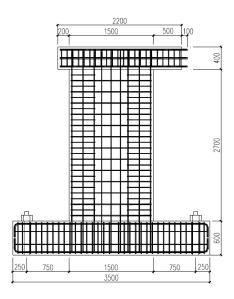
Positive facade reinforcement of cast in situ concrete shear wall
